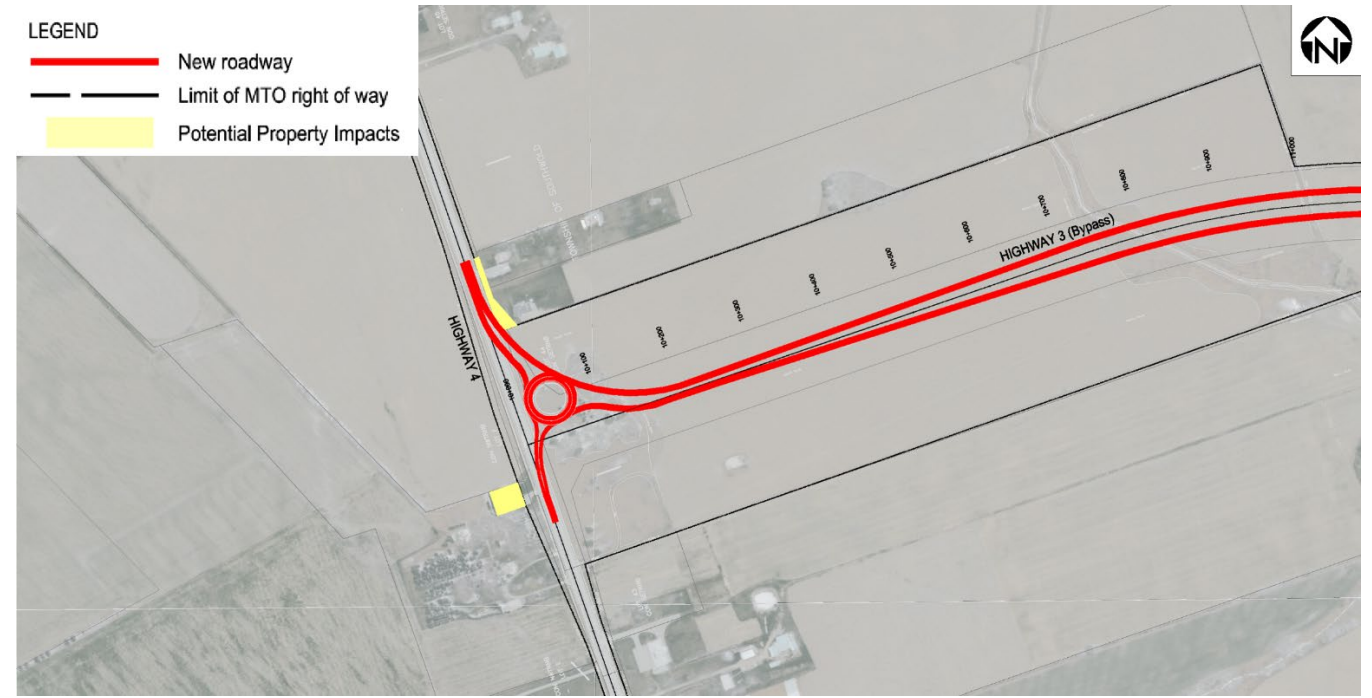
Highway 4 Intersection Alternative 3: Roundabout Talbotville Bypass to Highway 4 Mainline (Without East to North Bypass Lane)
